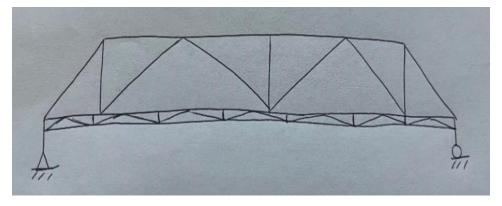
Over slung Truss - Hand Drawn Sketch
